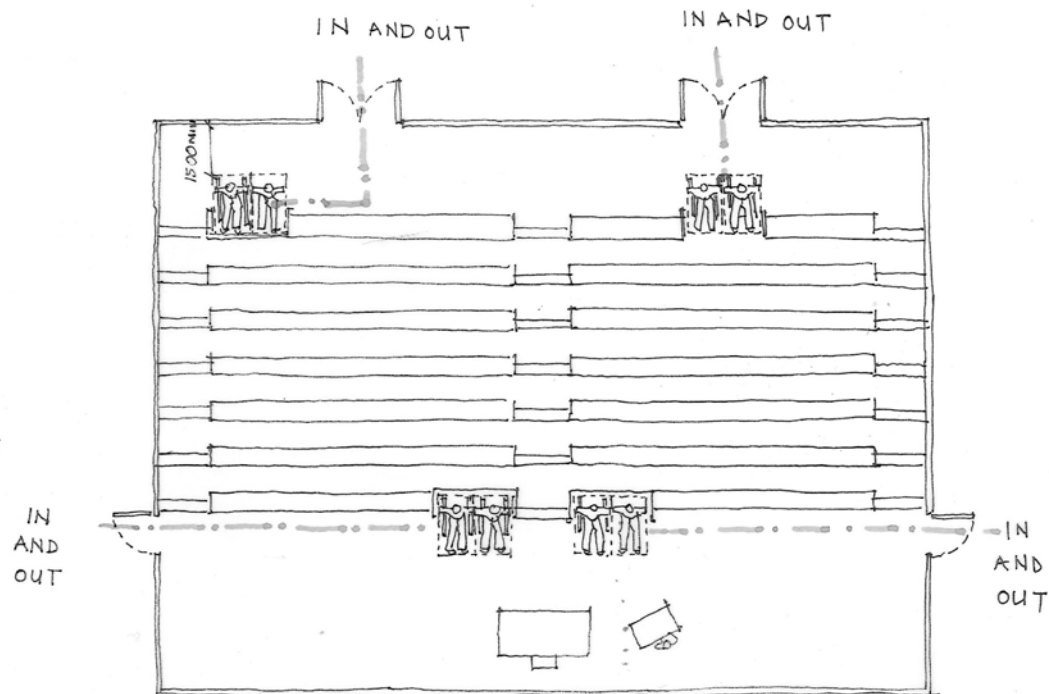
PLAN VIEW – wheelchair space in Auditorium
